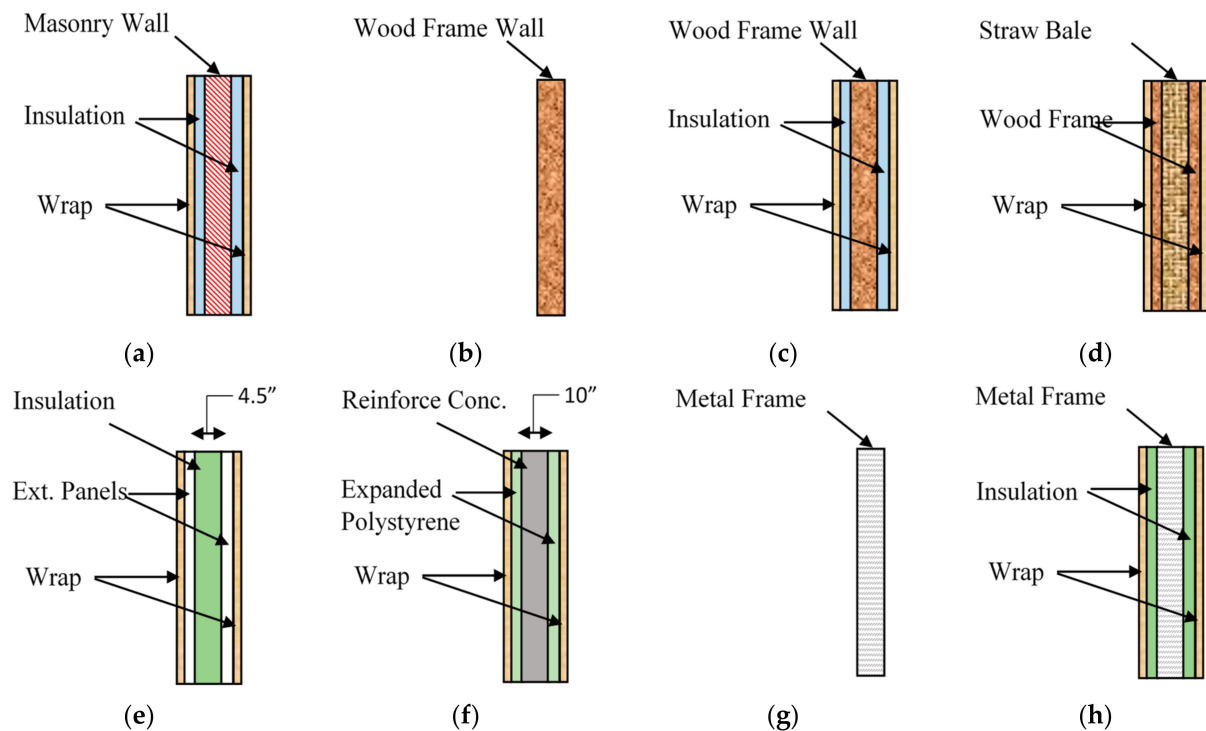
Different types of walls for office and warehouse buildings. (a) WO2: Masonry wall with insulation; (b) WO3: Wood wall without insulation; (c) WO4: Wood wall with insulation; (d) WO5: Straw bale wall; (e) WO6: Structurally insulated panel; (f) WO8: Insulated concrete foam; (g) WH1: Metal frame wall without insulation; (h) WH2: Metal frame wall with insulation.
